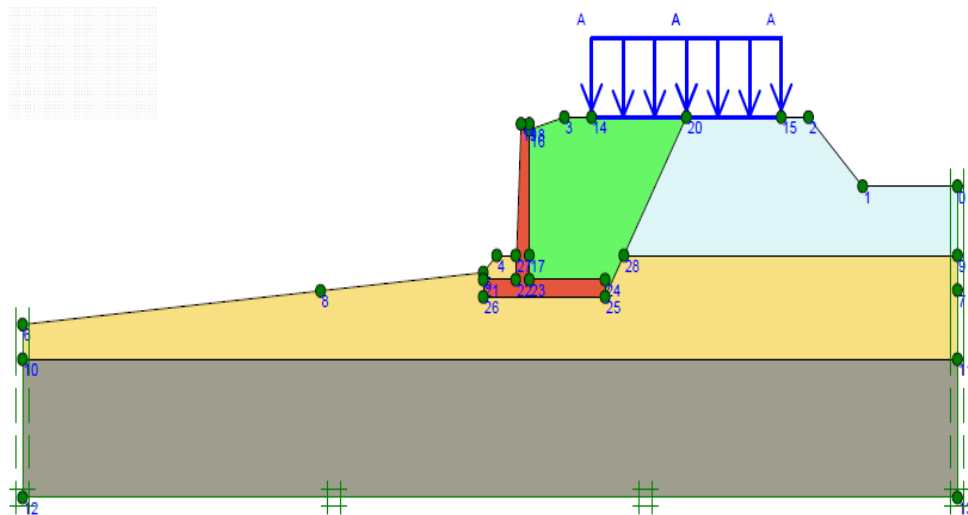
BH-01 Slope Geometry with Cantilever Type Retaining Wall Installation
